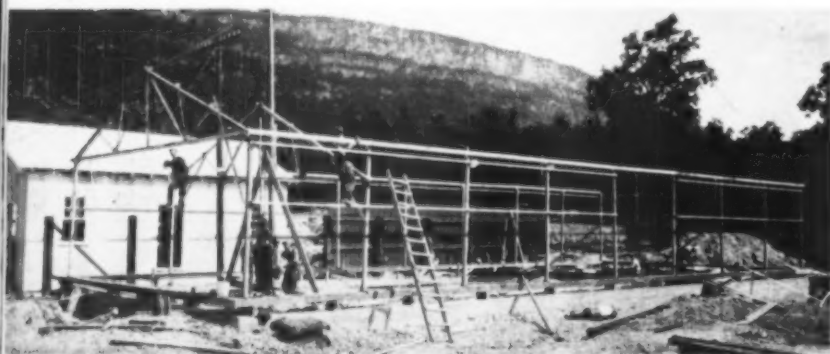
10:30 A.M., FIRST DAY—Erection of steel roof trusses is begun with aid of A-frame and gin-pole rig.
